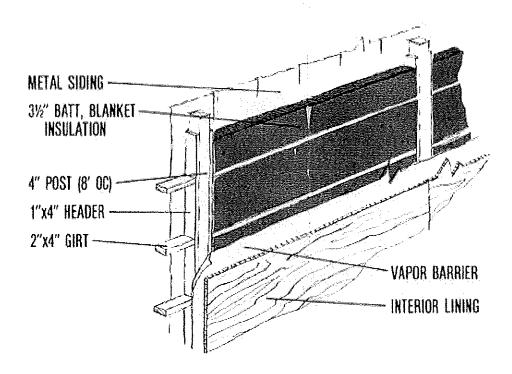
Post wall with batt or blanket insulation (R=13-15). This 4-inch post wall with batt or blanket insulation is common in heated buildings. It is usually more economical to build than the stud wall shown in Figure 8.
